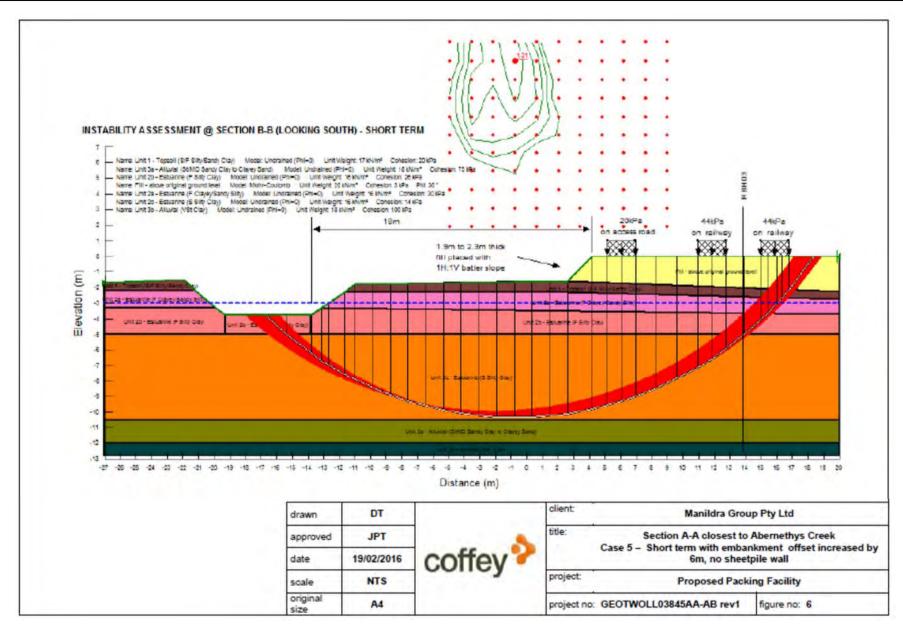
Case 5 – Short term with embankment offset increased by 6 m, no sheetpile wall (extract Figure 6 – Coffey's Geotechnical Assessment)
